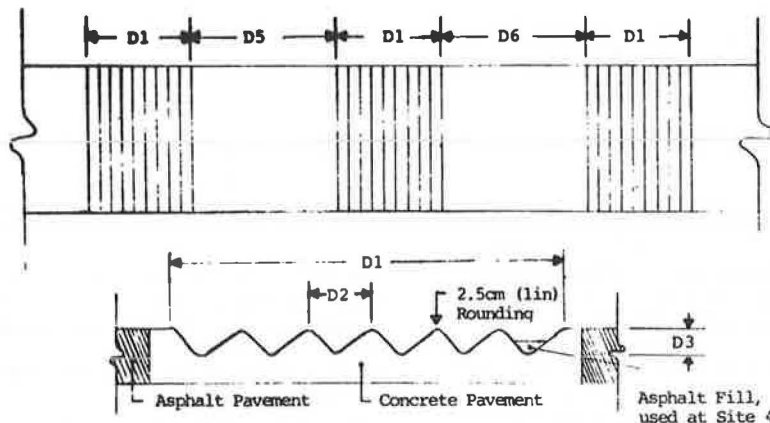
Strip layout: Site 1, East-West Toll Road, and Site 4, Tri-State Tollway.
